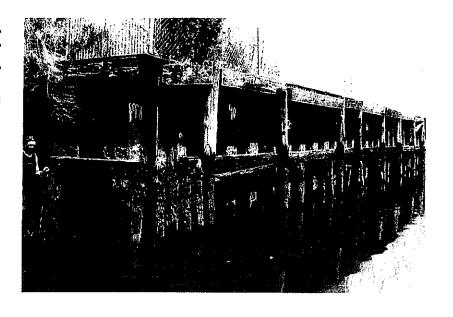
STA. 3+00 END STEEL SHEETING BULKHEAD BEGIN TIMBER BULKHEAD
